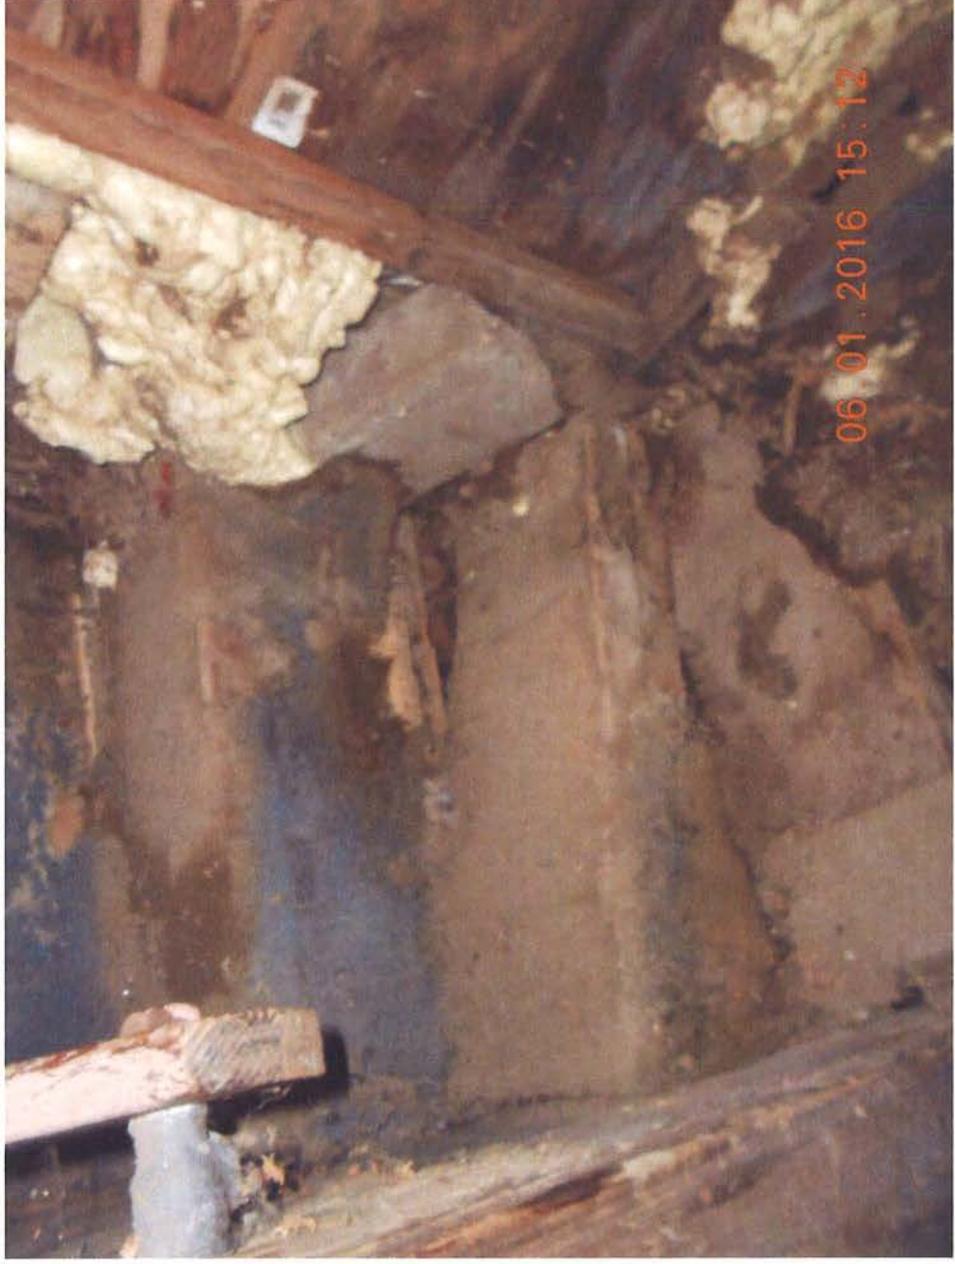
shows incomplete renovations with illegally installed plumbing in violation of Code.
